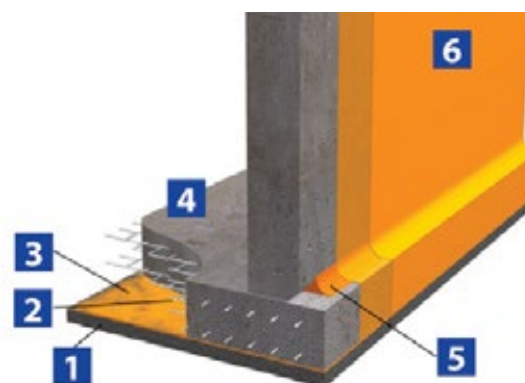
Comprehensive waterproofing of basement using Hydrostop: 1 - lean concrete; 2 - reinforcement; 3 - foundation slab; 4 - edge of slab sealed with Hydrostop-Proffessional Compound; 5 - wedge-shaped seal made from Hydrostop-Mortar; 6 - side of wall waterproofed with Hydrostop-Proffessional Compound.
